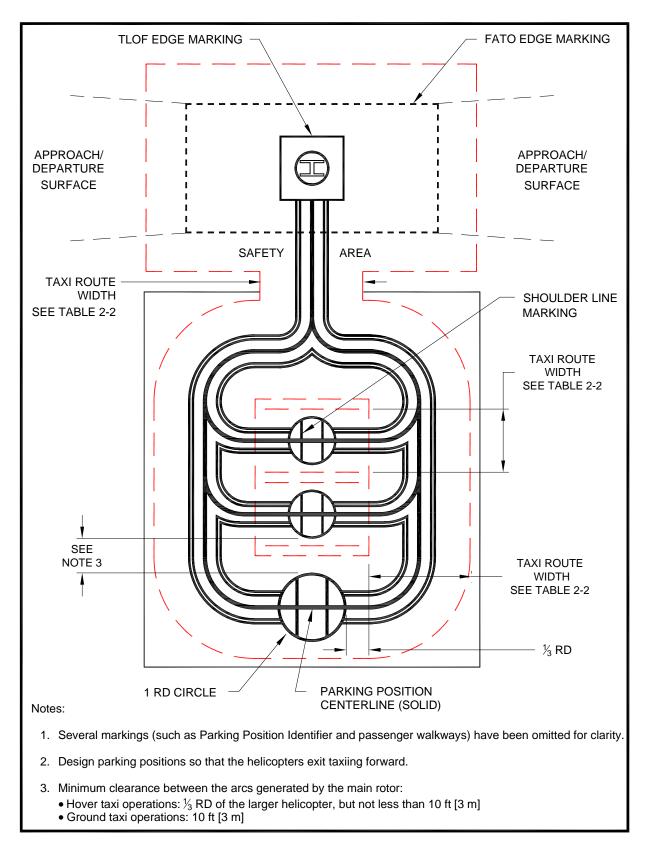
Parking Area Design – "Taxi-through" Parking Position
